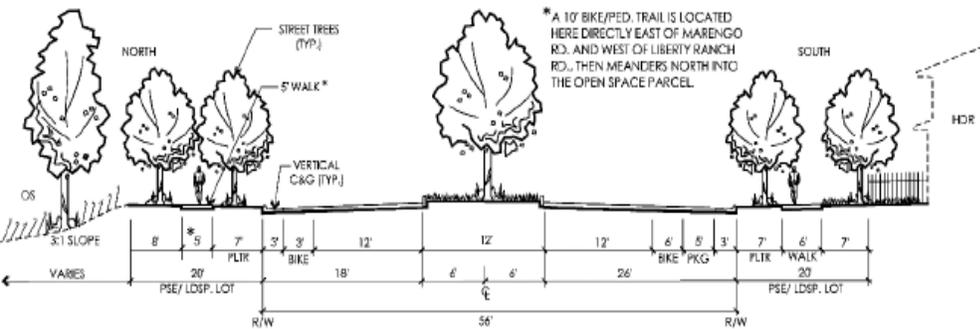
Walnut Avenue - 2 Lanes West of Liberty Ranch Road
